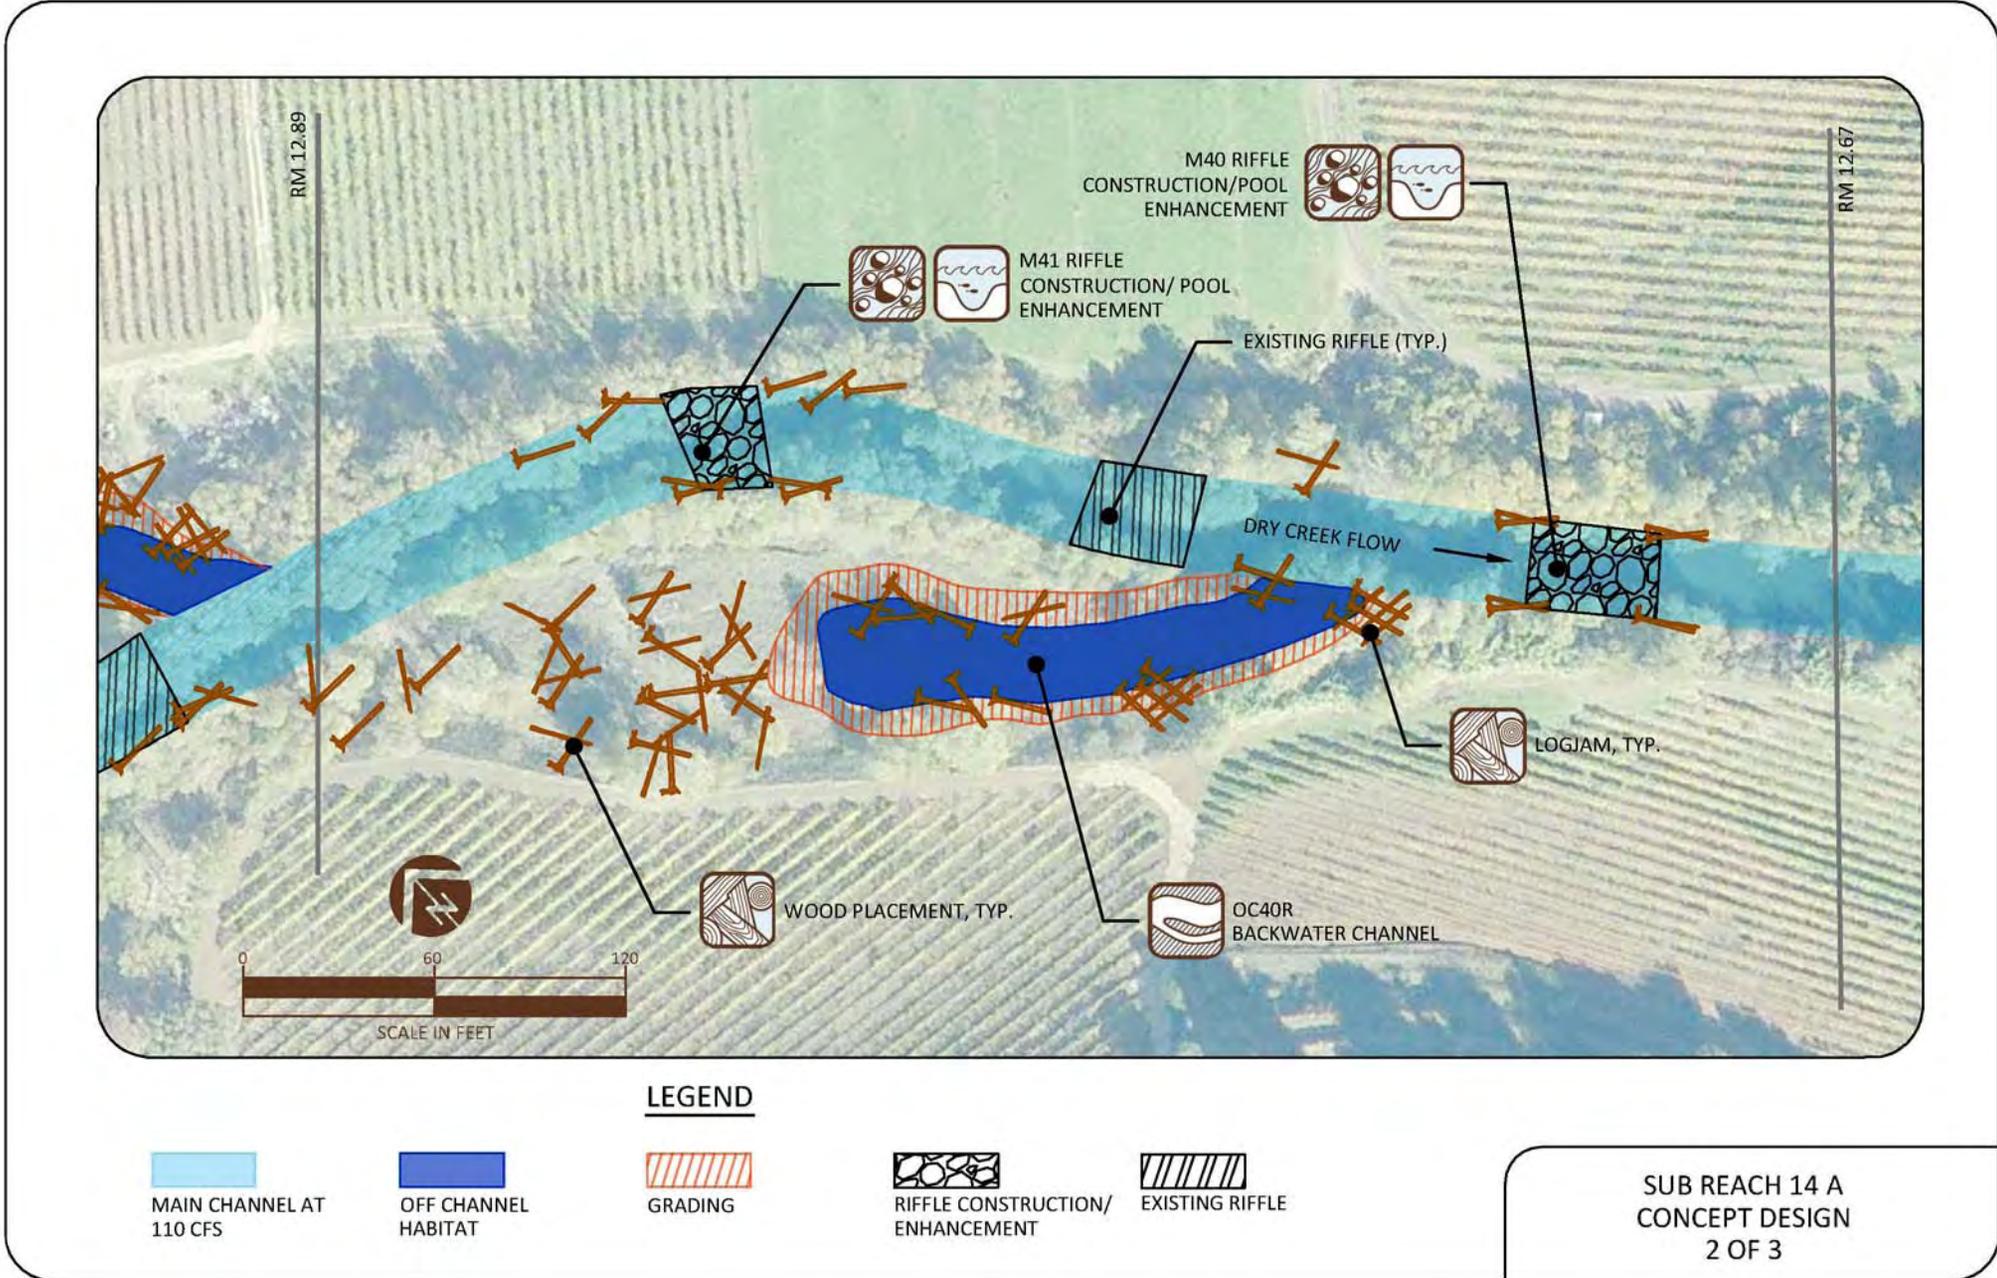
Sub-reach 14a conceptual design detail sheet 2 of 3.
